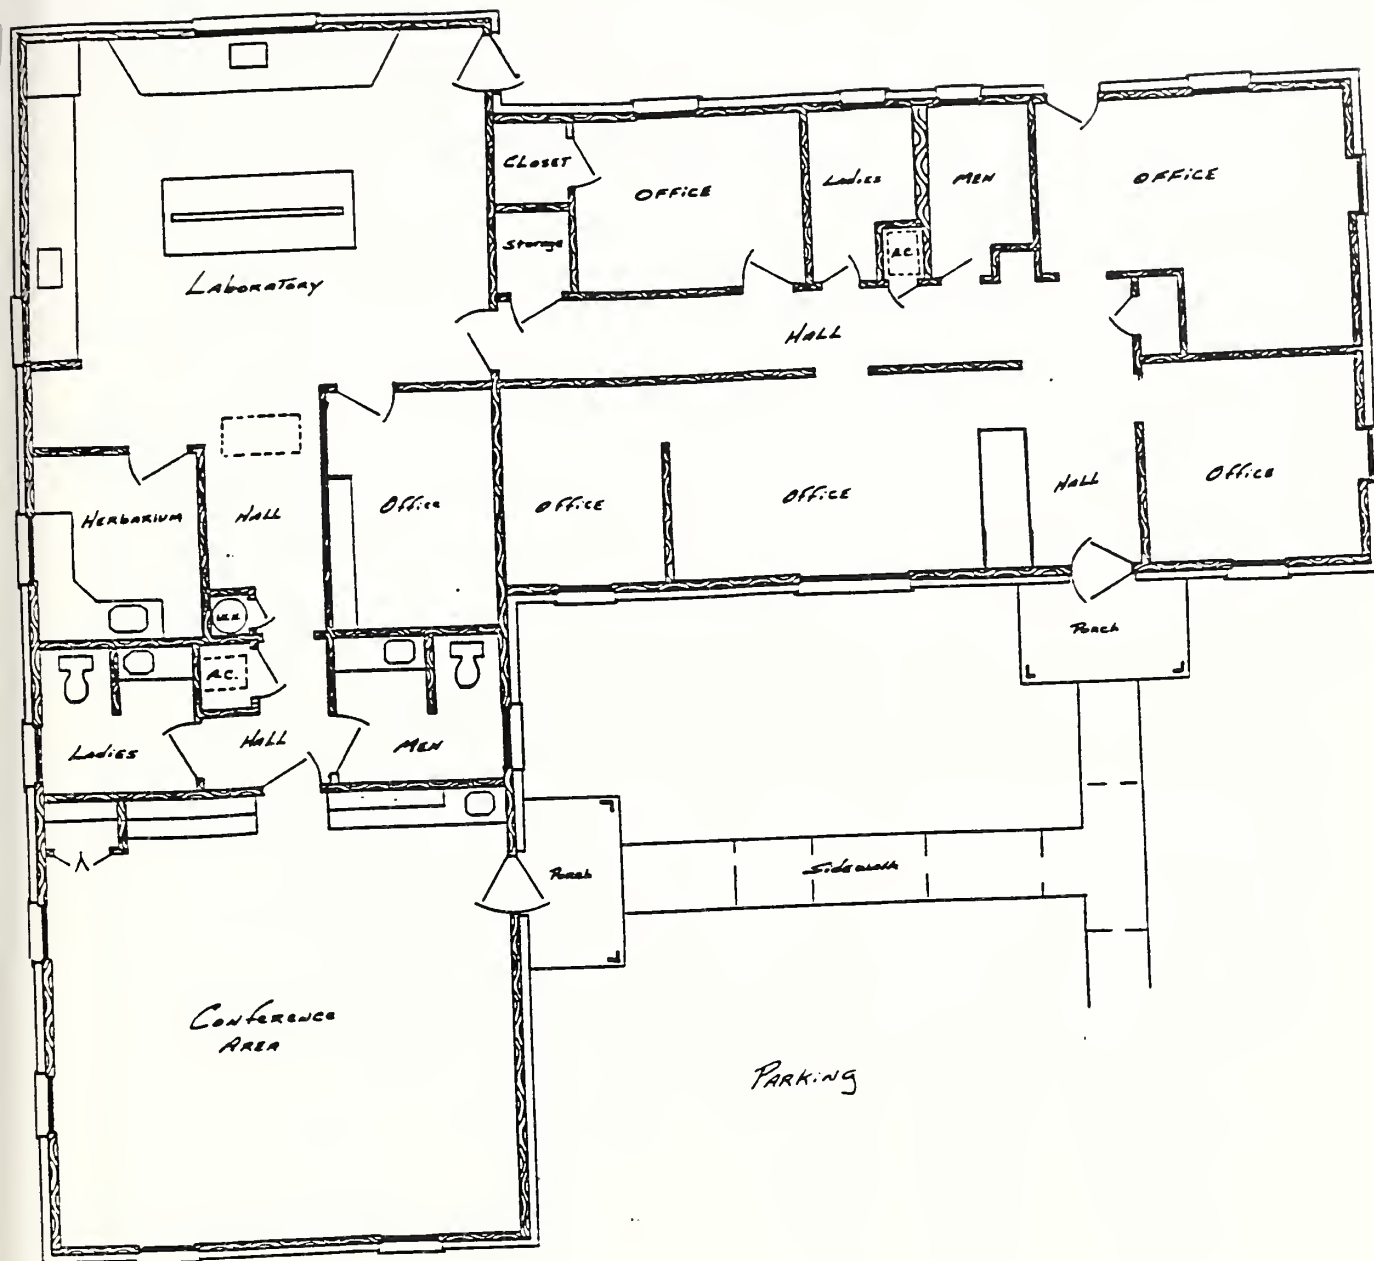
Floor plan for PMC office building showing conference area and laboratory completed in 1991.
